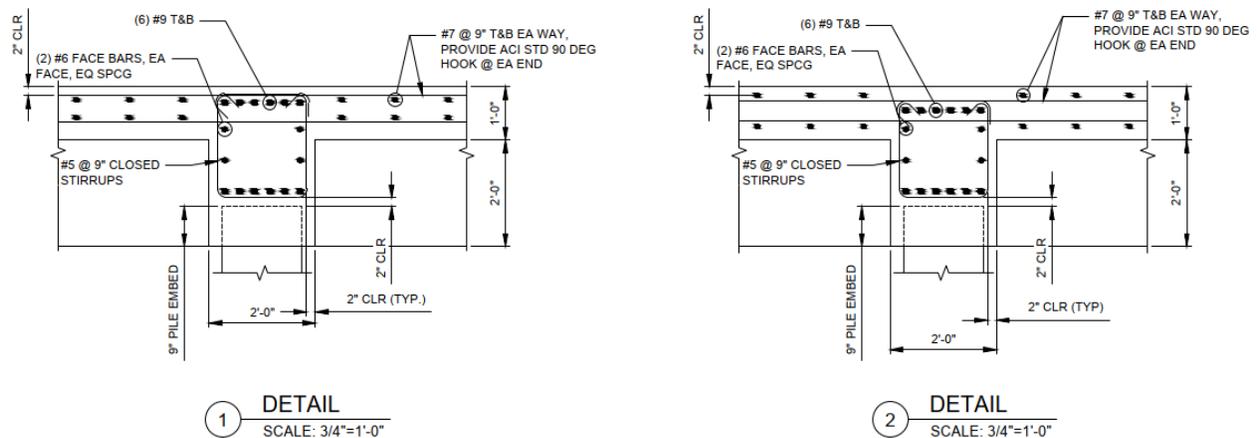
Electric Building and Generator Platform Cross-Section
